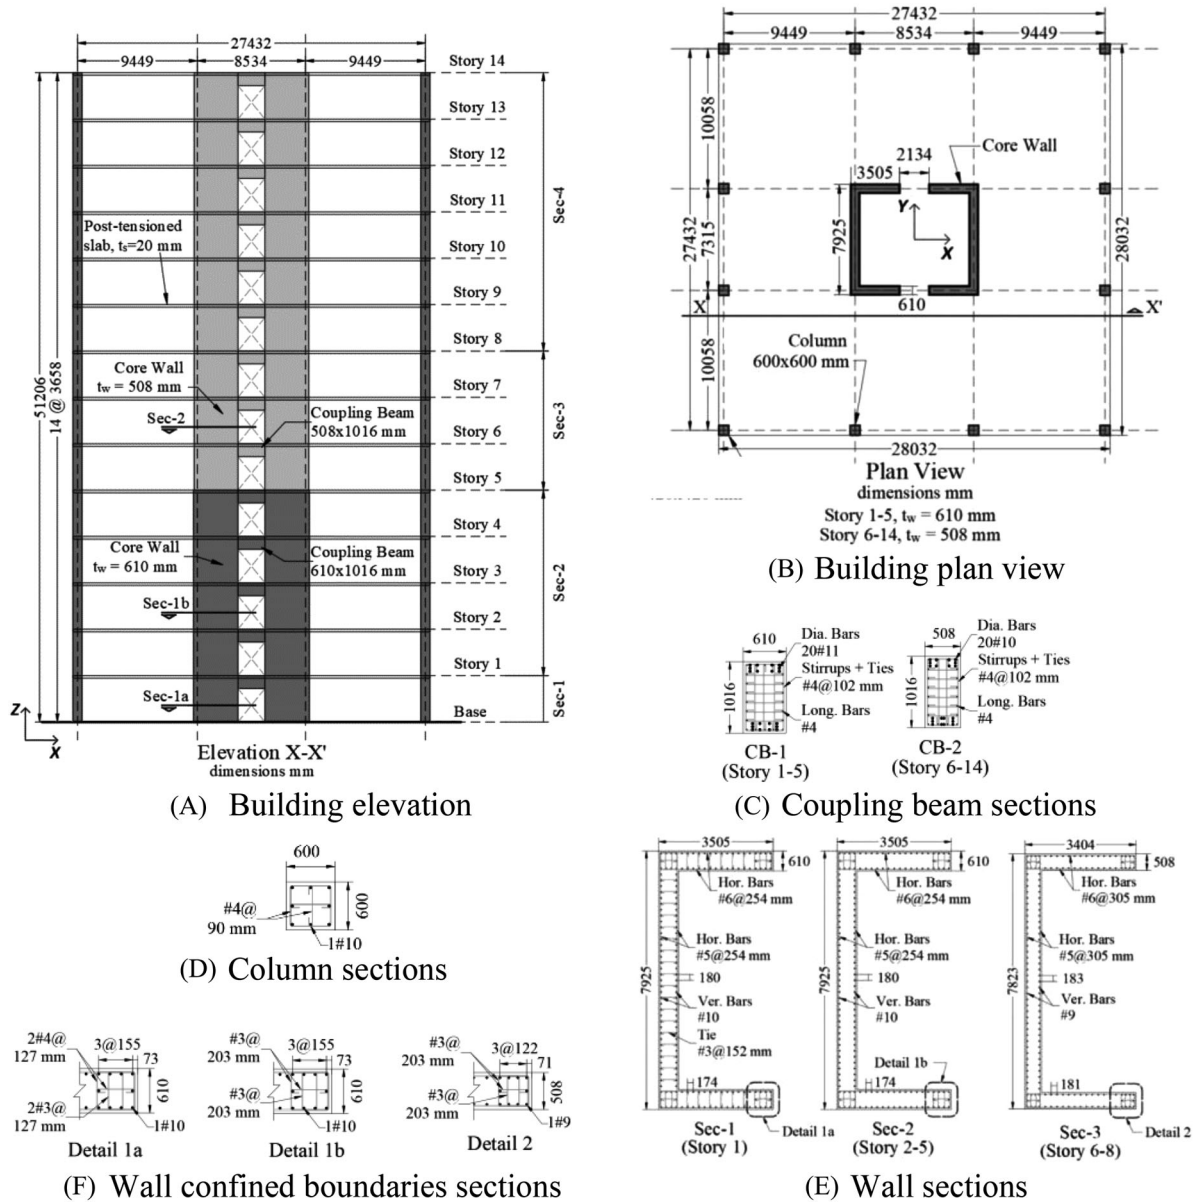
Geometry and section details of the building (Alvarez³⁵)
